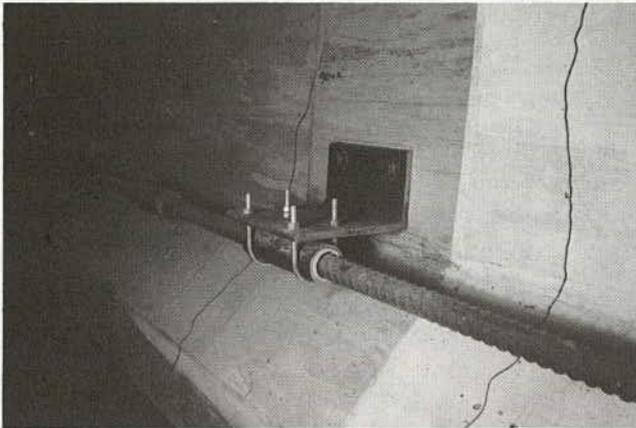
Corbel elevation and U-bolts for post-tensioned splice 1.
